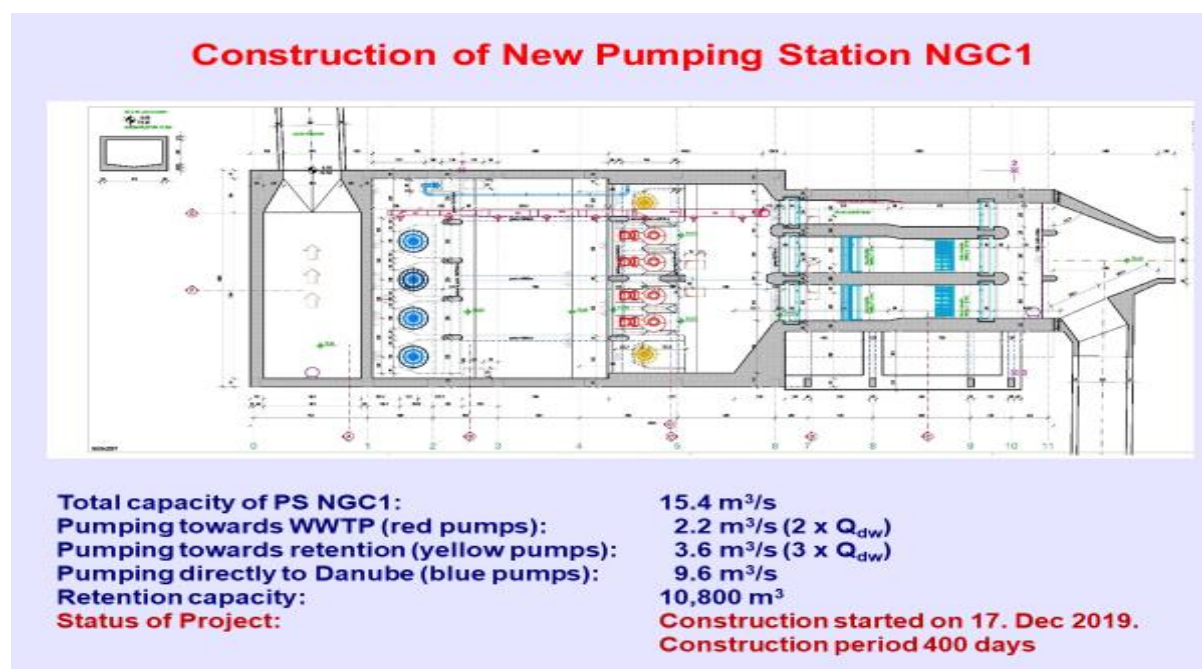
New Pumping Station plan Source: Public utility company Waterworks and Sewerage Novi Sad – Radoica Stefanović
